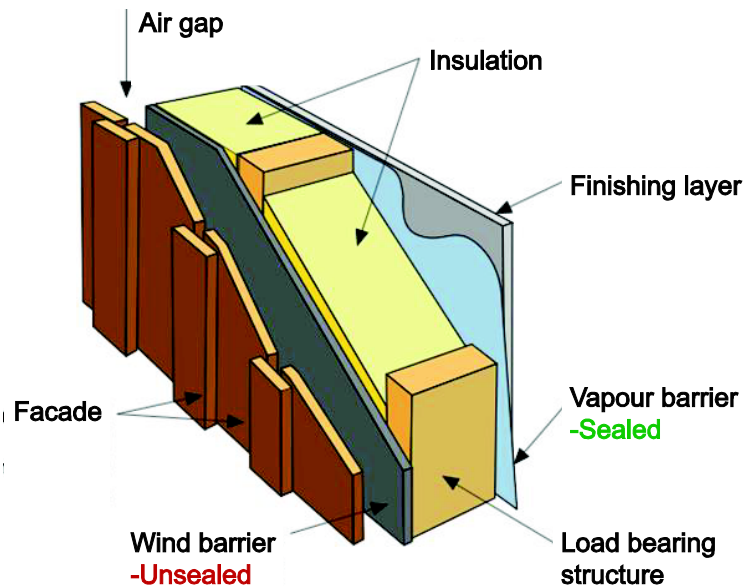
Illustration of typical Swedish wood frame wall layout (Bankvall, 2013).
